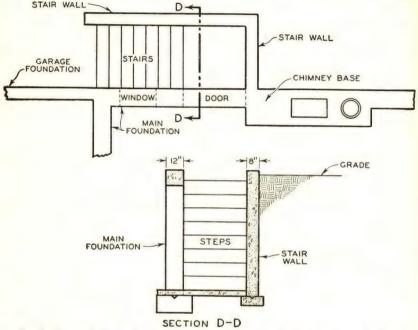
Plan and Section Views of Stair Wall at F in Foundation Shown in Fig. 3
